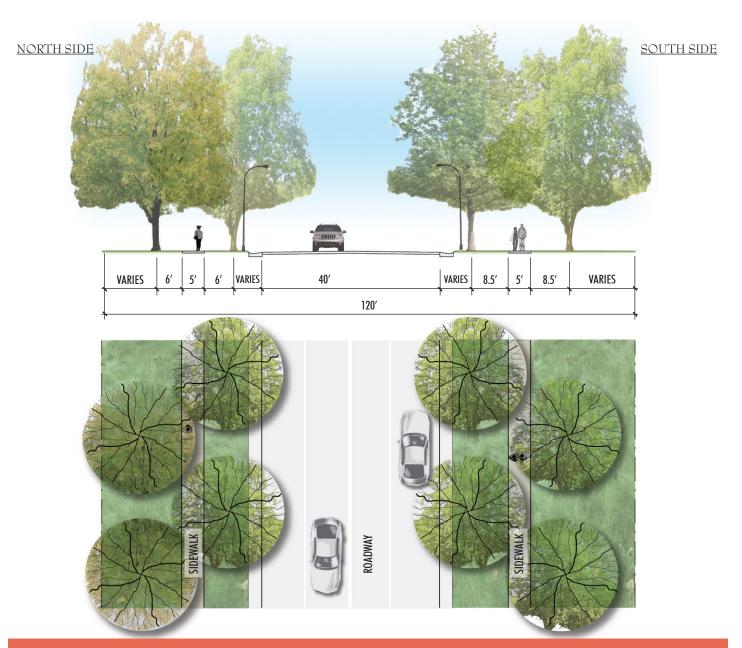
Eastern Parkway: Zone 6 Existing Conditions Section and Plan
